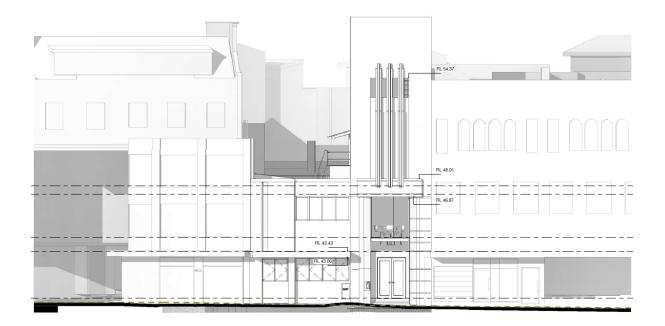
Darlinghurst Road Elevation (no external works proposed)
